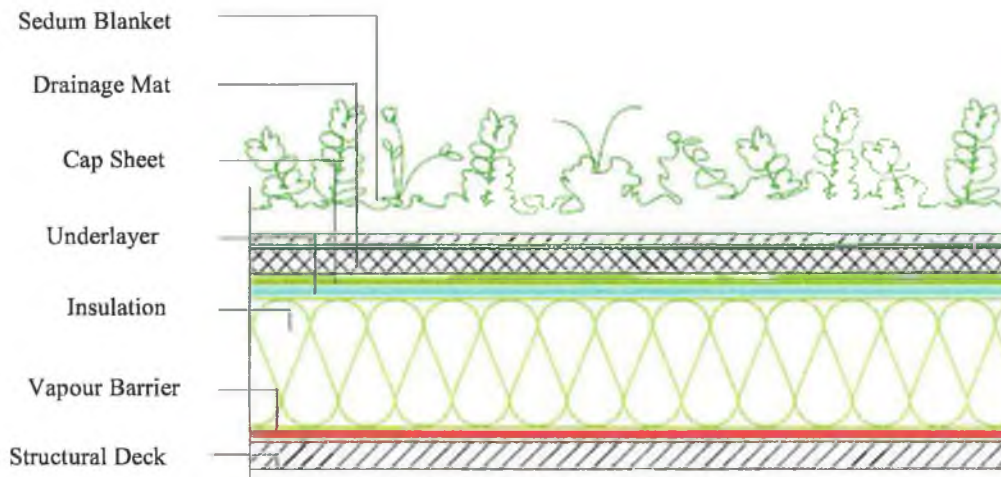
Typical build up – Extensive Sedum Blanket ©Bauder
